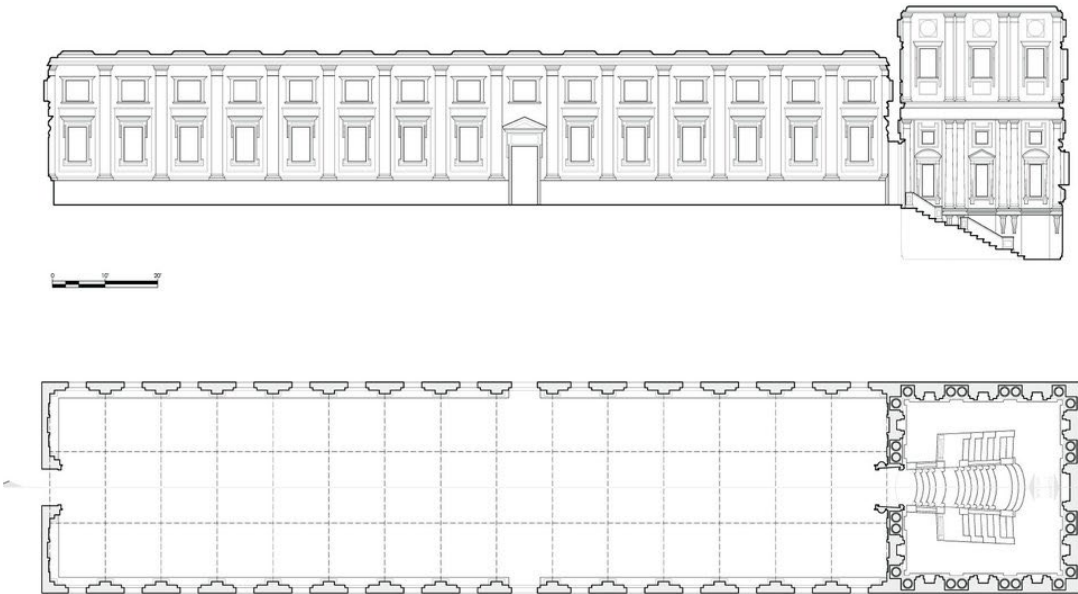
Laurentian Library floorplan and section (Bailey, n.d.)
